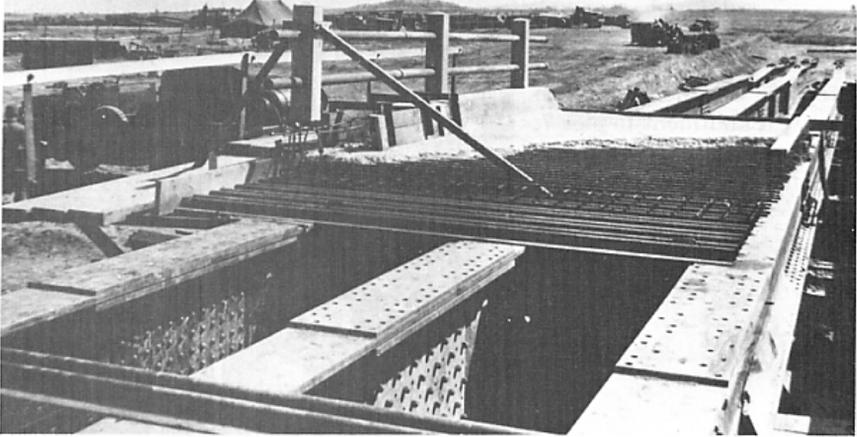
Full-scale model of a section of decking that was built in the work yard for practice and testing purposes.
